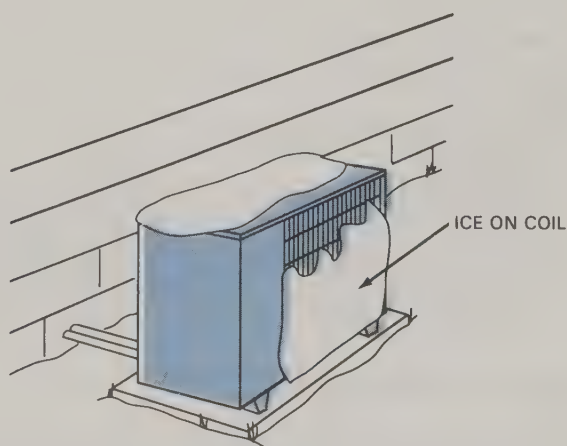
A defrost cycle is needed to remove frost on the outdoor coil of a heat pump.
